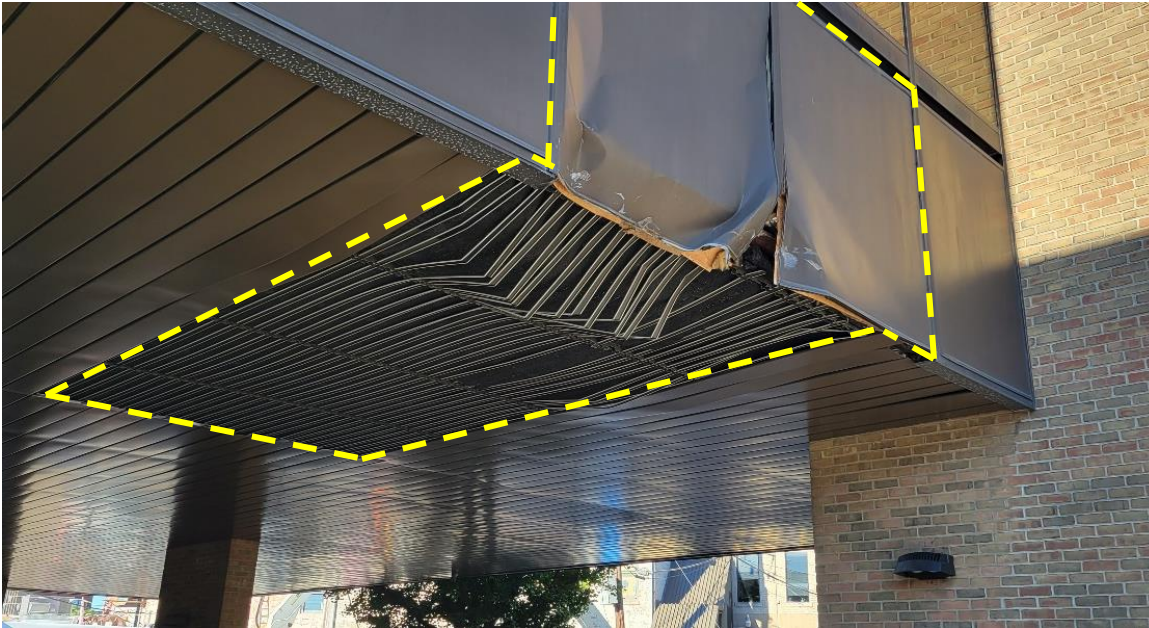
Overview of impact damage of north facade cladding and north side of parking lot ceiling.
